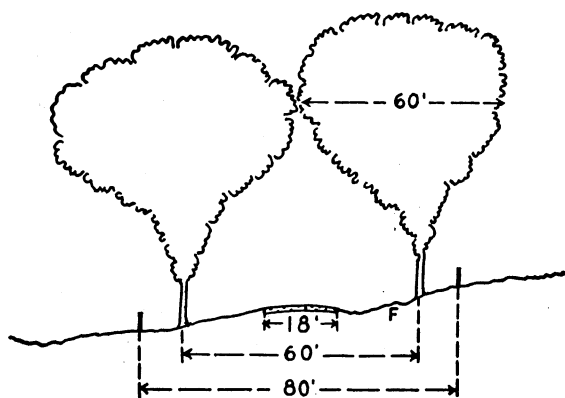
An 80-foot right of way with an 18-foot improved section and the trees placed 30 feet from the center line, with the footpath (F) inside the trees. These trees could be placed 10 feet nearer the center of the road without interfering with the road, but they look better at this greater distance apart unless planted informally
